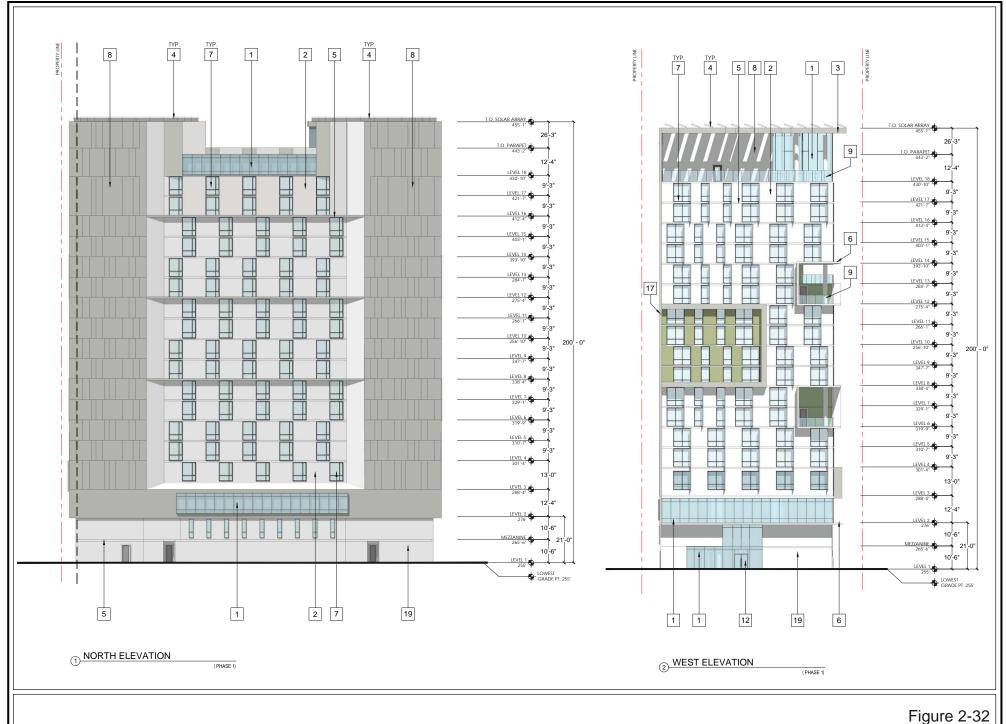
North and West Elevation (Phase 1) - Site 1
